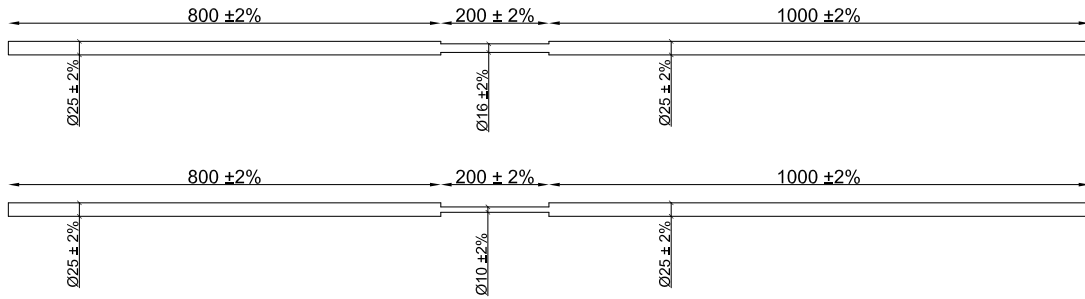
Details of the damaged (reduced rebar) steel reinforcements.
